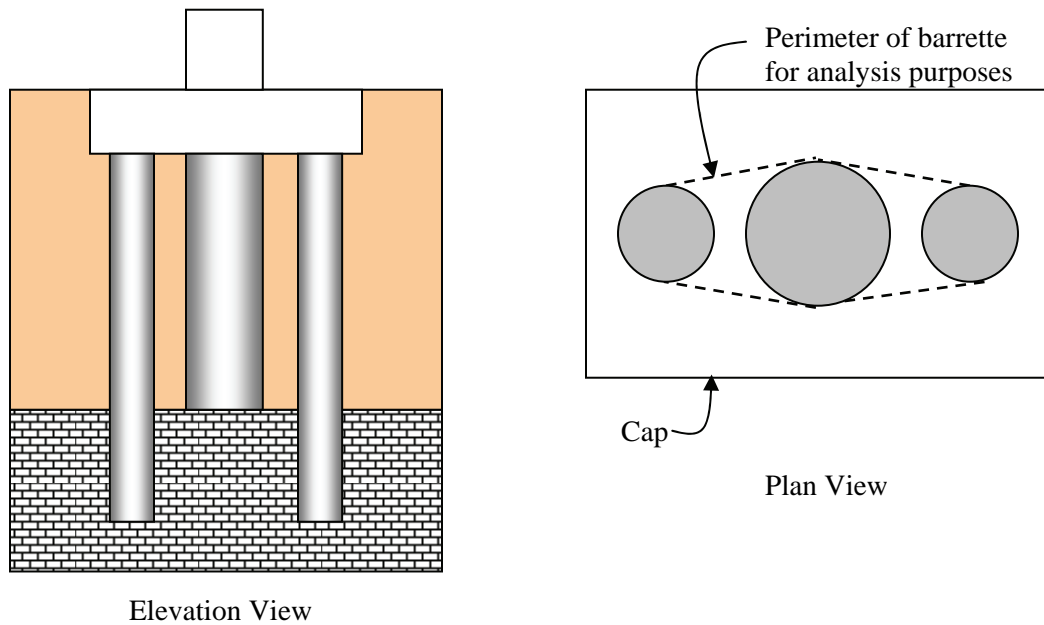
Use of Sister Shafts to Supplement an Existing Foundation (McGillivray & Brown, 2007)
